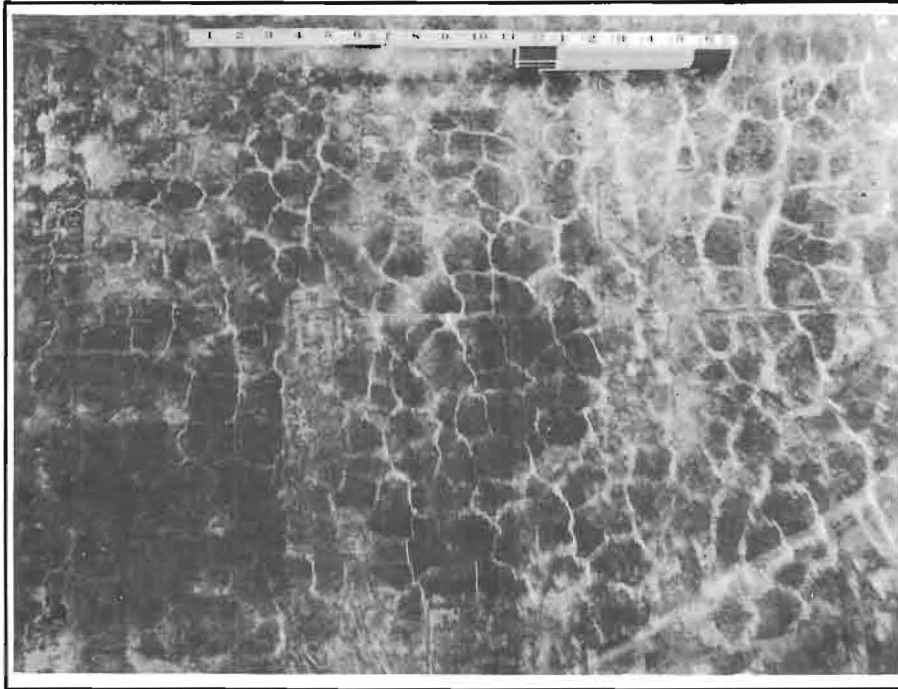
Imprint of the crack pattern developed in the bottom side of Slab DM-3 on the polyethylene sheet placed between the slab and the clay subgrade.
